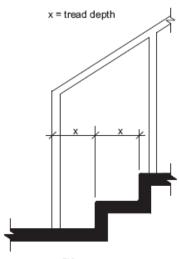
BOTTOM HANDRAIL EXTENSIONS AT STAIRS
